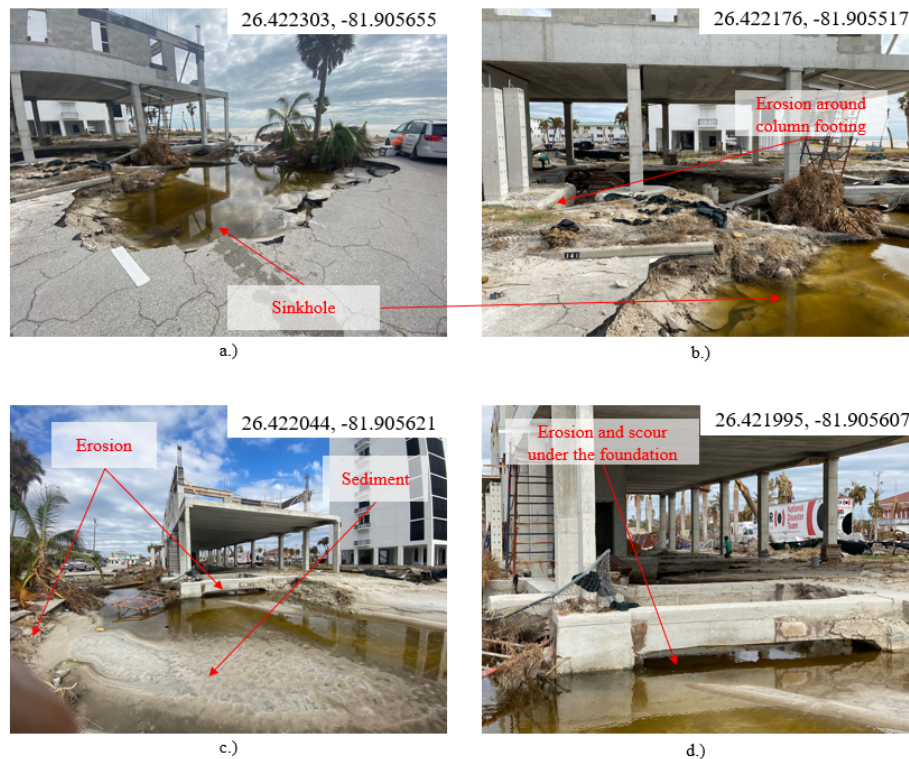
Ground images of failures observed in south east end of the Fort Myers Beach island, near Sunset Condominium: (a) Sinkholes caused by extreme scour and erosion resulting in the ground depression underneath the paved driveway and foundation of the skeleton of a new building; (b) extreme scour underneath the foundation of the building resulted in exposure of the footing of the load bearing column; (b) ground photo capturing the depth and size of the sinkhole formed by extreme erosion and scour. Notable, exposed load-bearing column footings reveal the building's vulnerability to water's path, evident from the transported sediment; (c) ground photo of the transported sediment depicting path of water; (d) erosion and scour underneath the shallow foundation of the building
